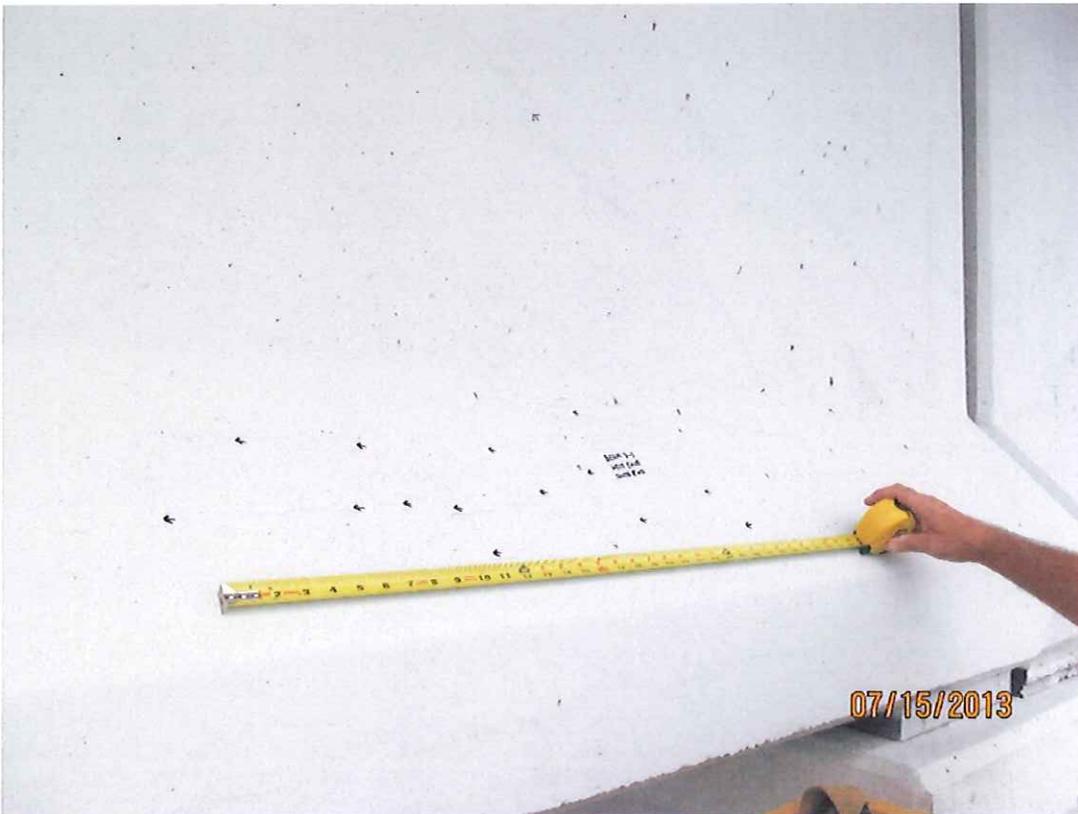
Typical longitudinal cracks along bottom flange (Beam 7-1 shown)
